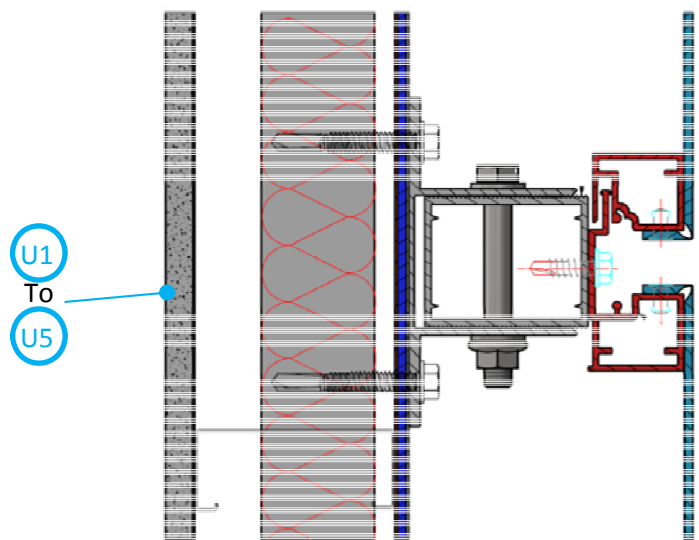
On unexposed face 900mm above combustion chamber opening, plan view
